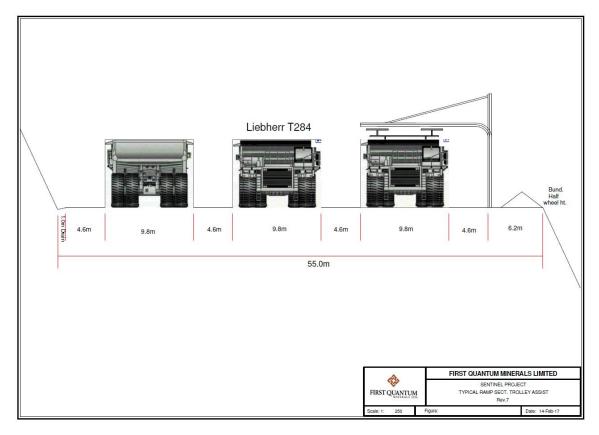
Schematic cross section across haul road for trolley-assist haulage
